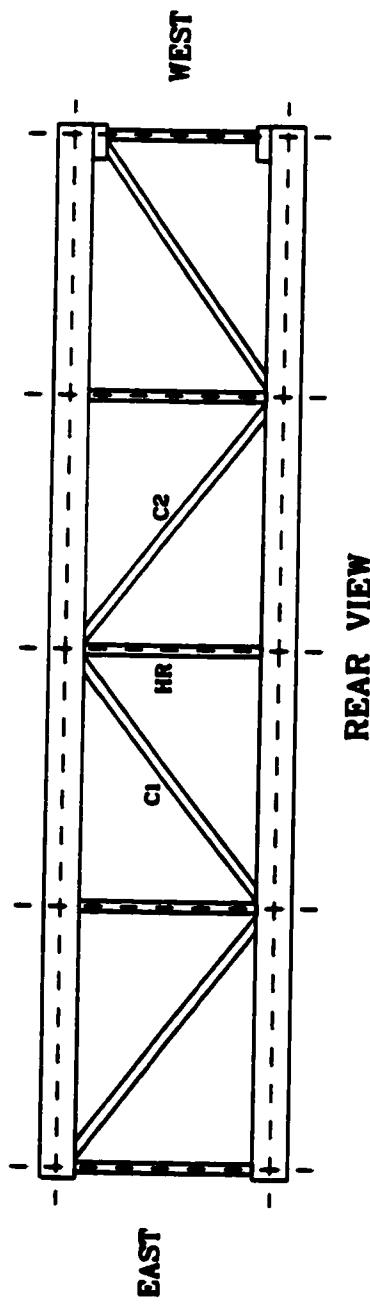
Dimensions of Specimens LR7 and LR11
